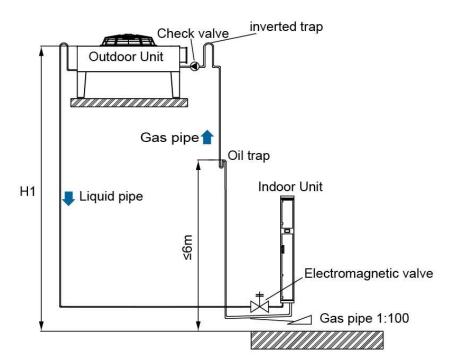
Installation drawing (when the condenser is higher than the indoor unit)
